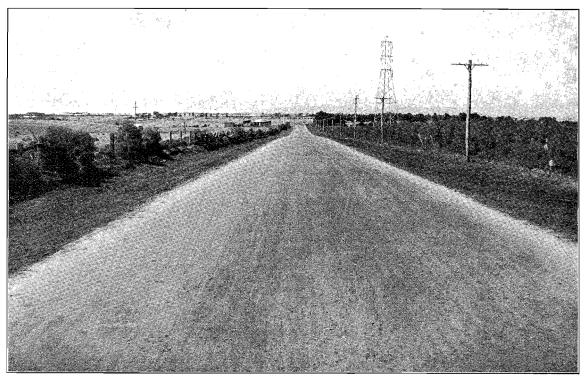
Reconstructed section of North-Western Highway between Melbourne and Keilor.
